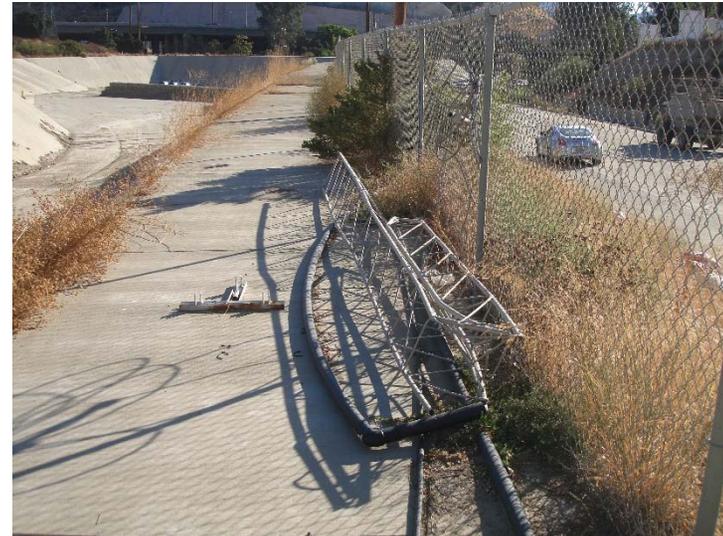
Terminal Basin Outlet Risers: September 26, 2017
